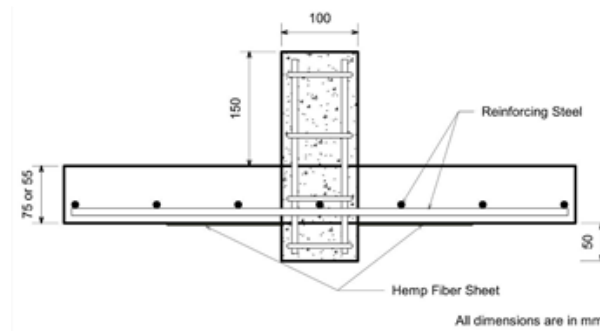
Dimensions and reinforcement details of the slab specimen
